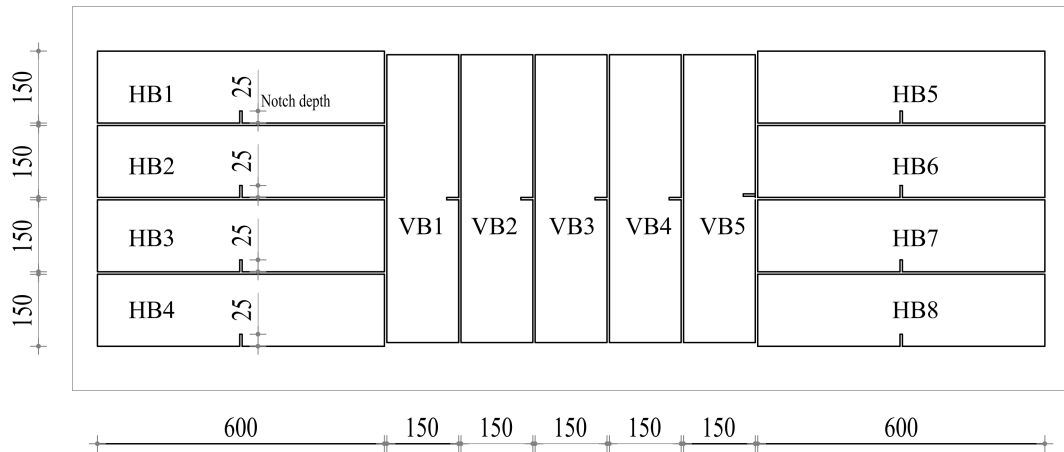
Saw cut and notched layout of sprayed beams for EN 14651 [7] 3PBT.
